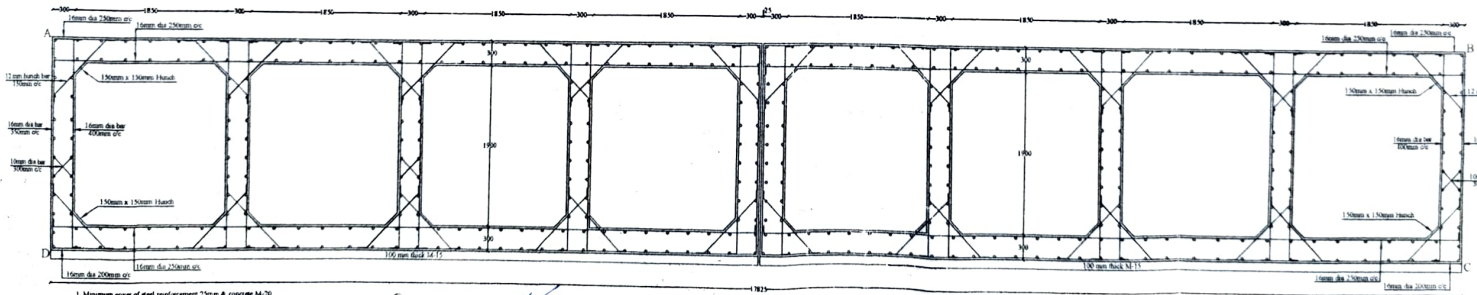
DETAILS OF REIN IN VERTICAL WALL OVER BARREL IN FS. SCALE 1:50
